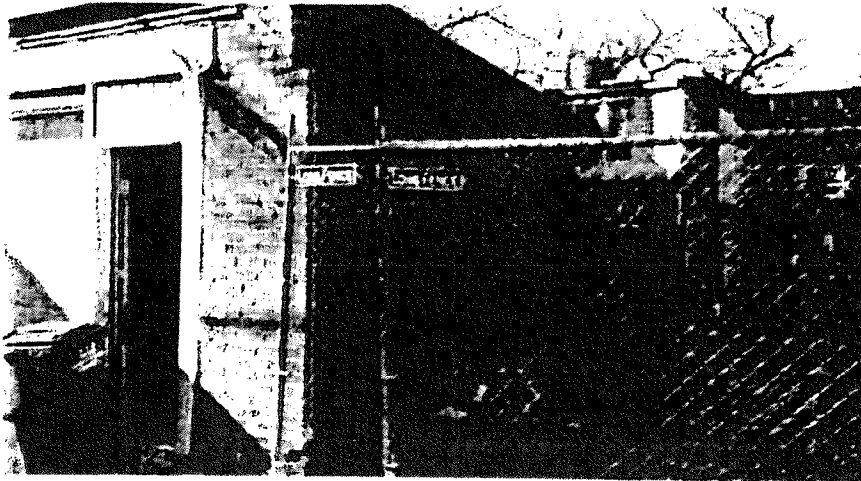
Existing Garage Party Wall between 1828 and 1830 Ontario PL
